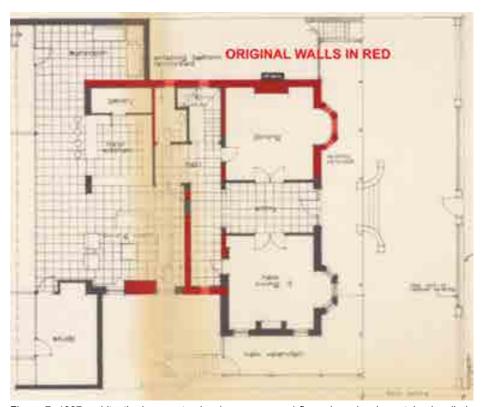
1987 architect's documents showing new ground floor plan, showing retained walls in red.
